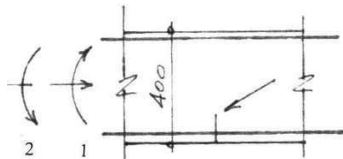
The ceiling of a buried underground structure section, 400 mm thick, eccentrically loaded
